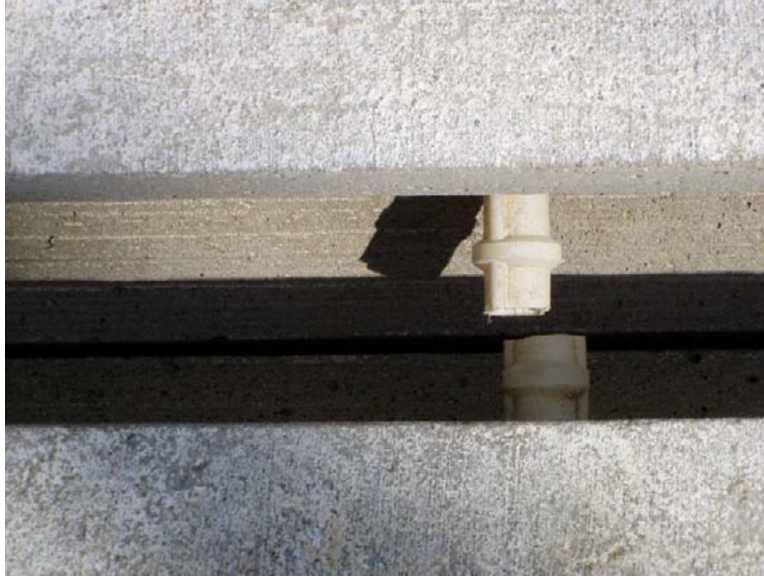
Photo. Slight misalignment of transverse post-tensioning ducts at the longitudinal joint.
